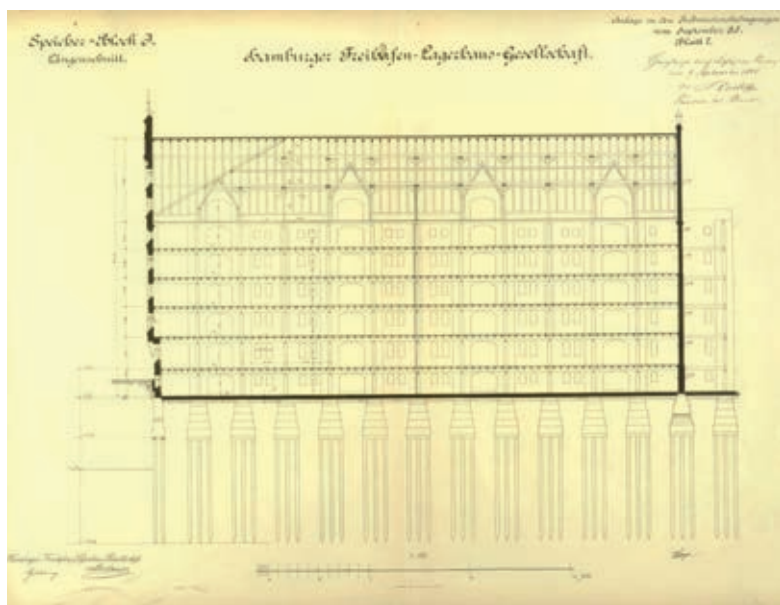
Section through warehouse J with supporting pillar and beam construction, September 1885
